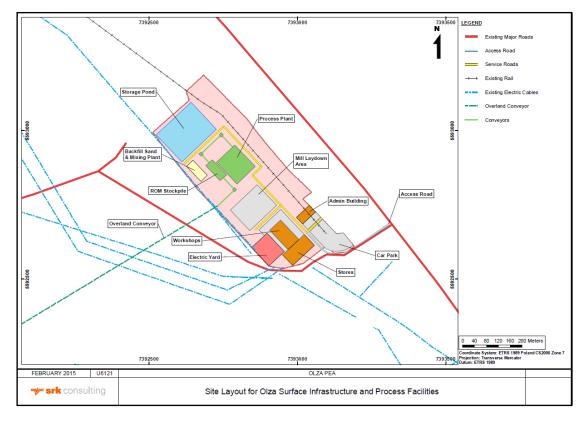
Conceptual Site Layout for Project Olza Surface Infrastructure and Process Facilities
